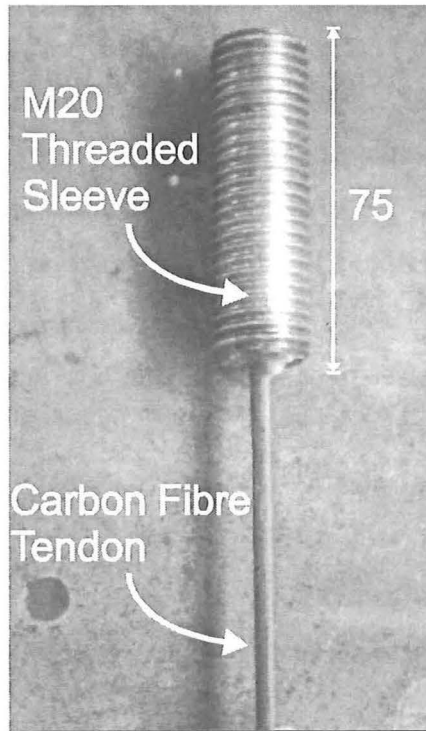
Detail of epoxied anchor of carbon fibre tendon.
